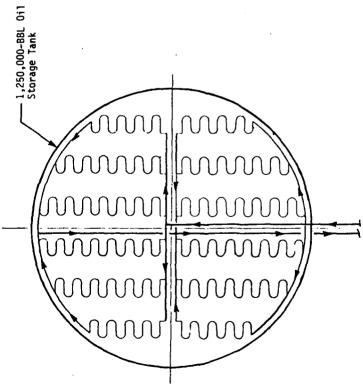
TANK HEATING SYSTEM/OIL HEATING MEDIA PIPING
